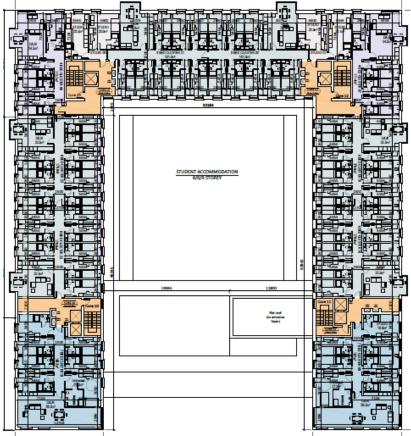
Proposed Student Residences B2 – Fourth and Fifth Floor Plans
